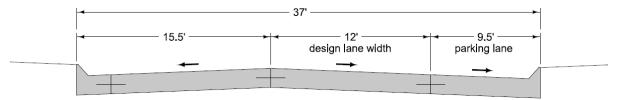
Two lane urban roadway with a parking lane and a standard paver width of 37 feet.
